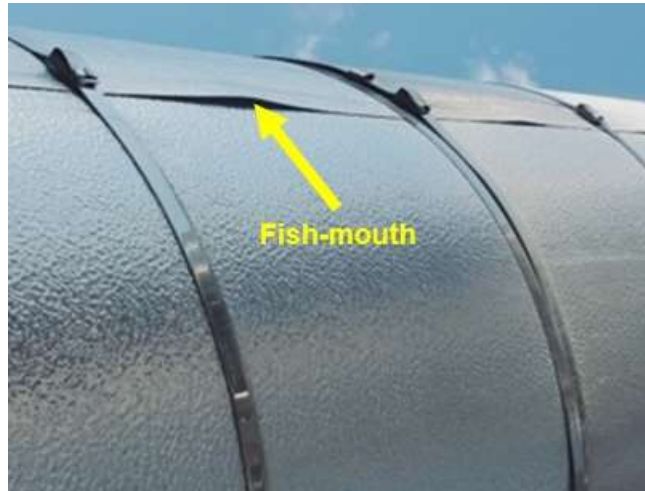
Typical fish-mouthing in the jacketing over thermal insulation
